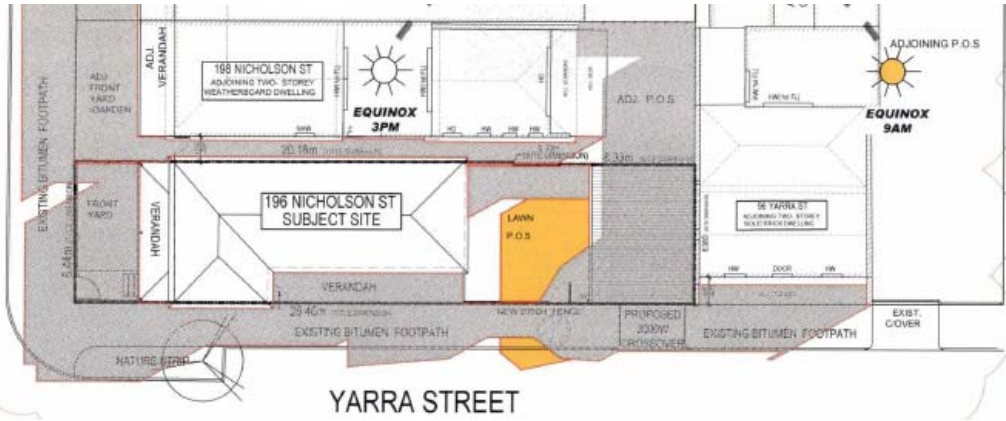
9am shadow diagram – addition shadows shown in orange (Applicant Submission)
